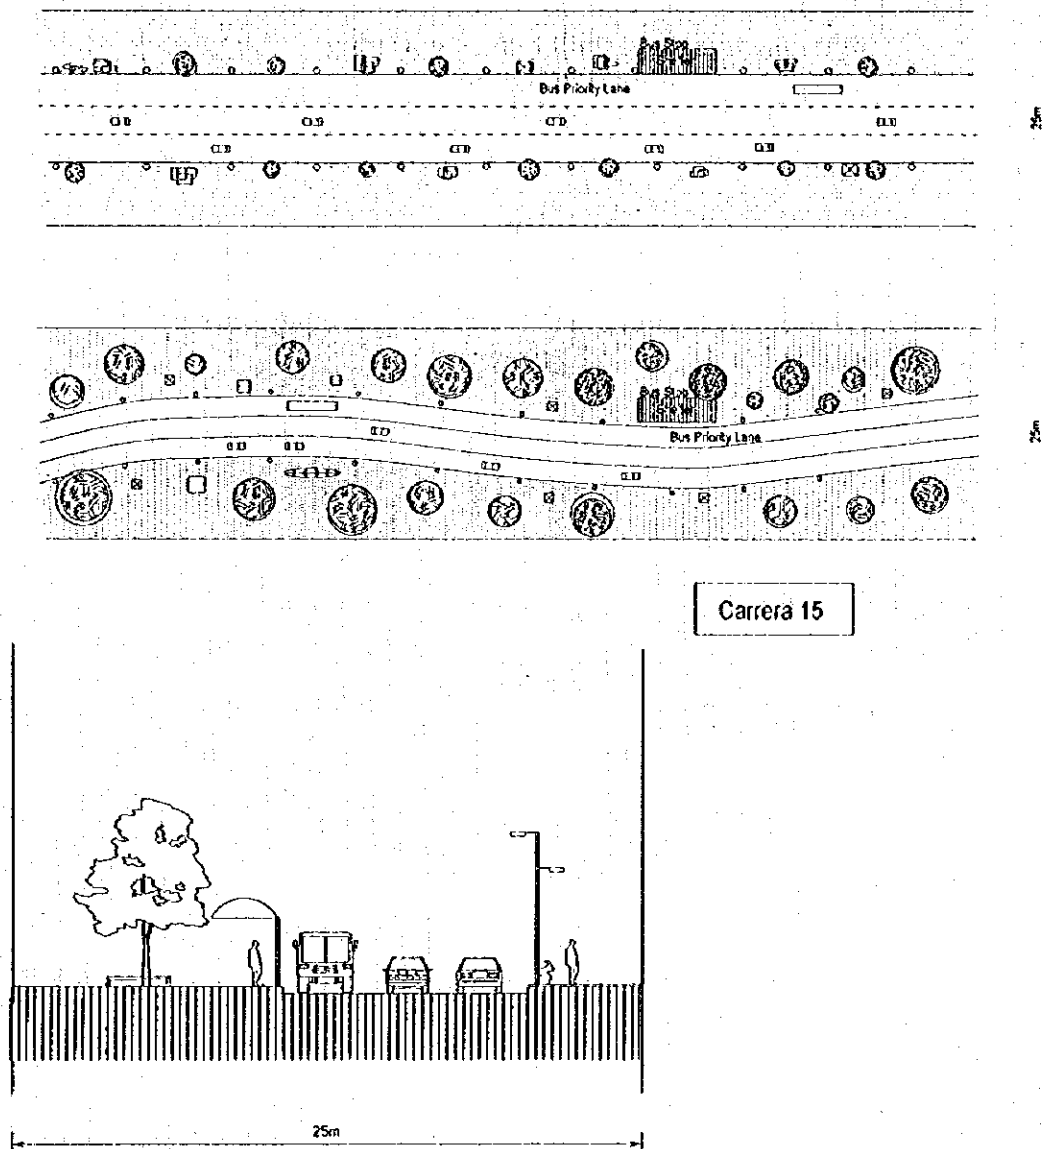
Typical Horizontal and Cross section: (Carrera 15)
